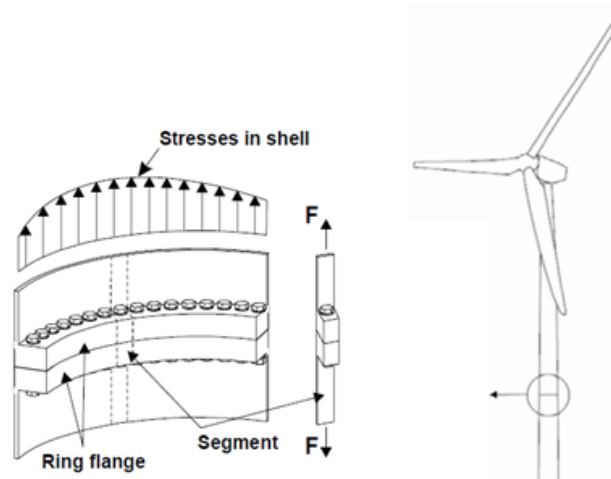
Flanges welded to the tower shell ends [46].
